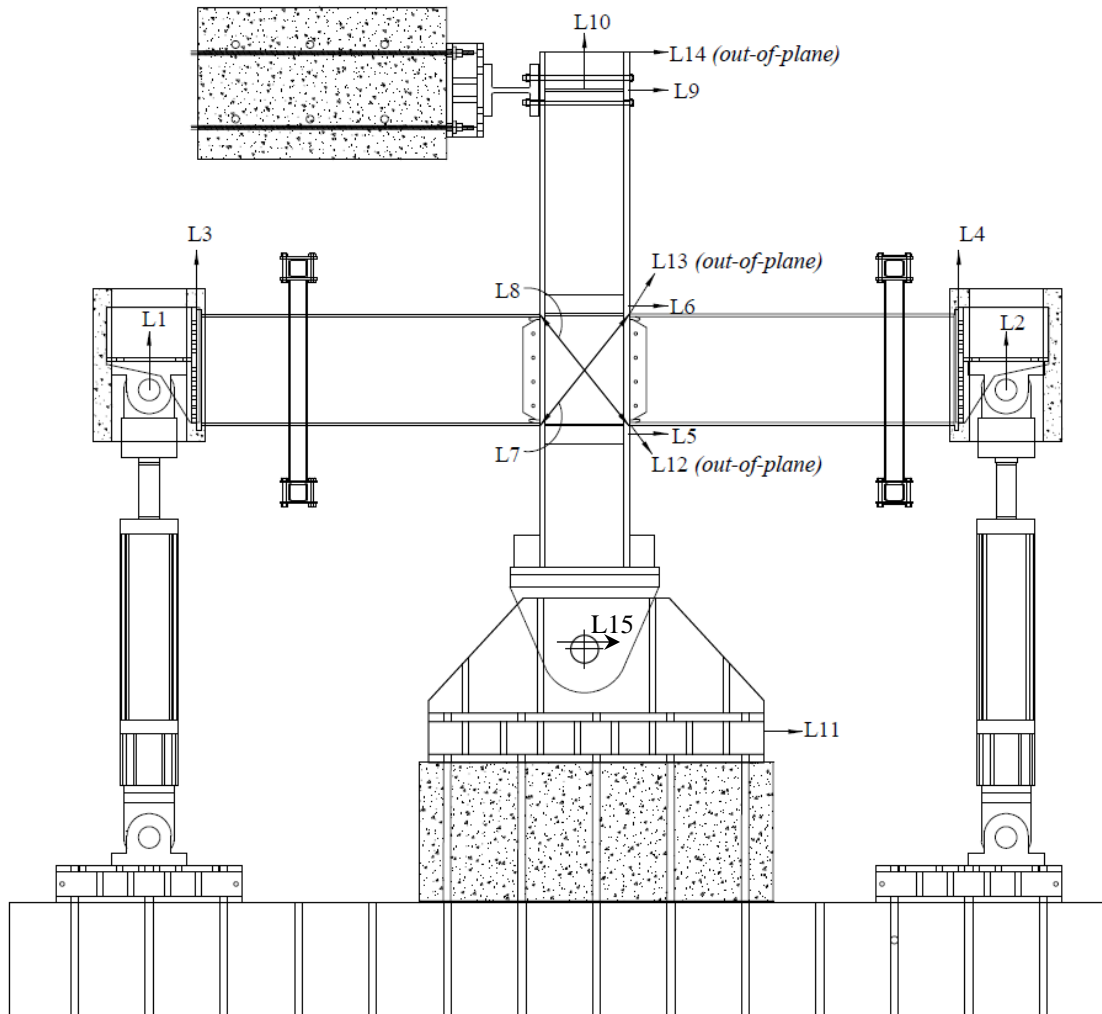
Interior Moment Connection Transducer Layout (Specimens W1 to W4)
